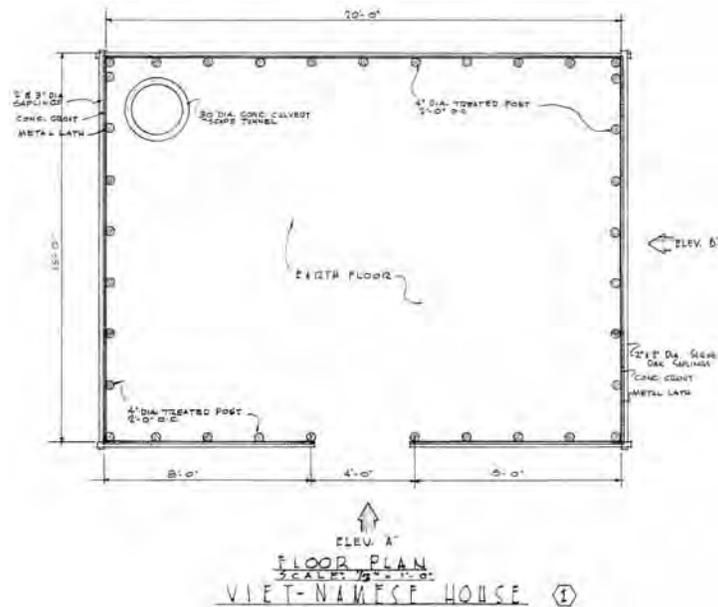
Vietnamese house floor plan, Camp Gordon, 1966 (standard drawing GOR 28-13-09 sheet 16, Vietnamese and Montagnard houses plans, elevations, and sections, 1 April 1966).
